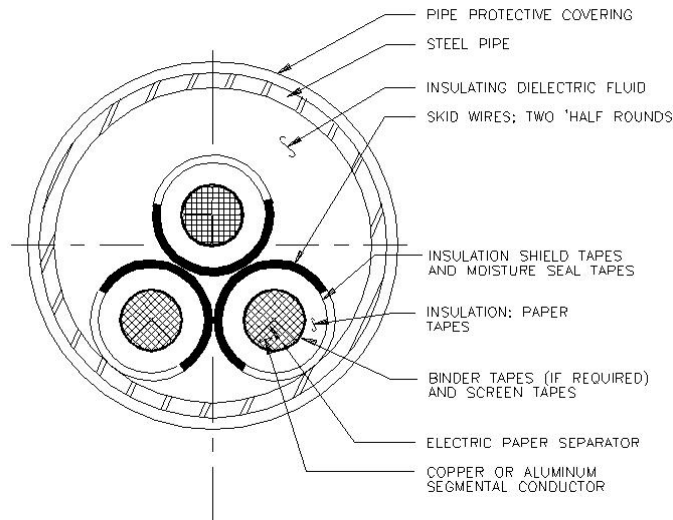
Typical HPFF Cable and Transmission Line Pipe Cross-Section
